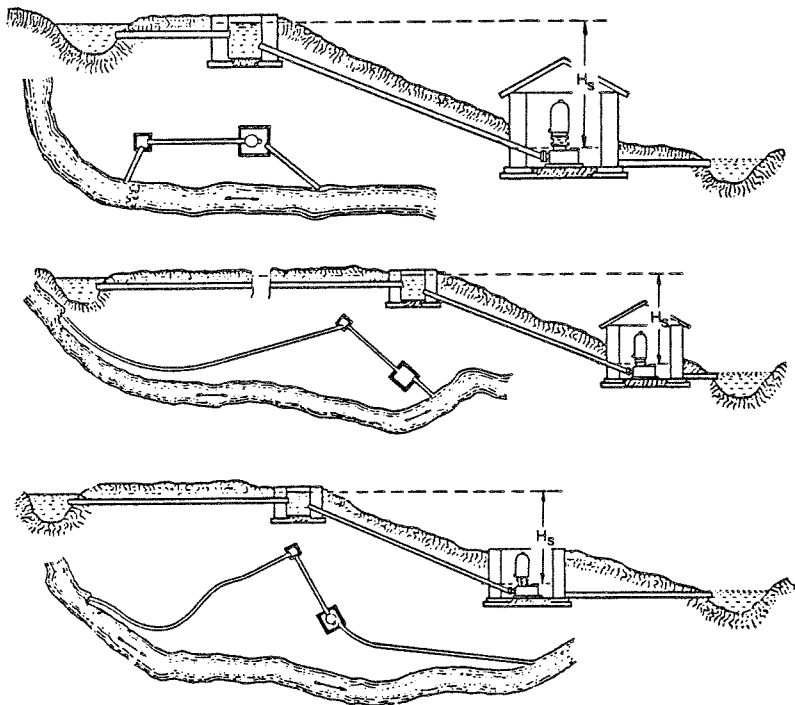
Possible lay-outs of a hydraulic ram installation (source: John Blake Ltd)
